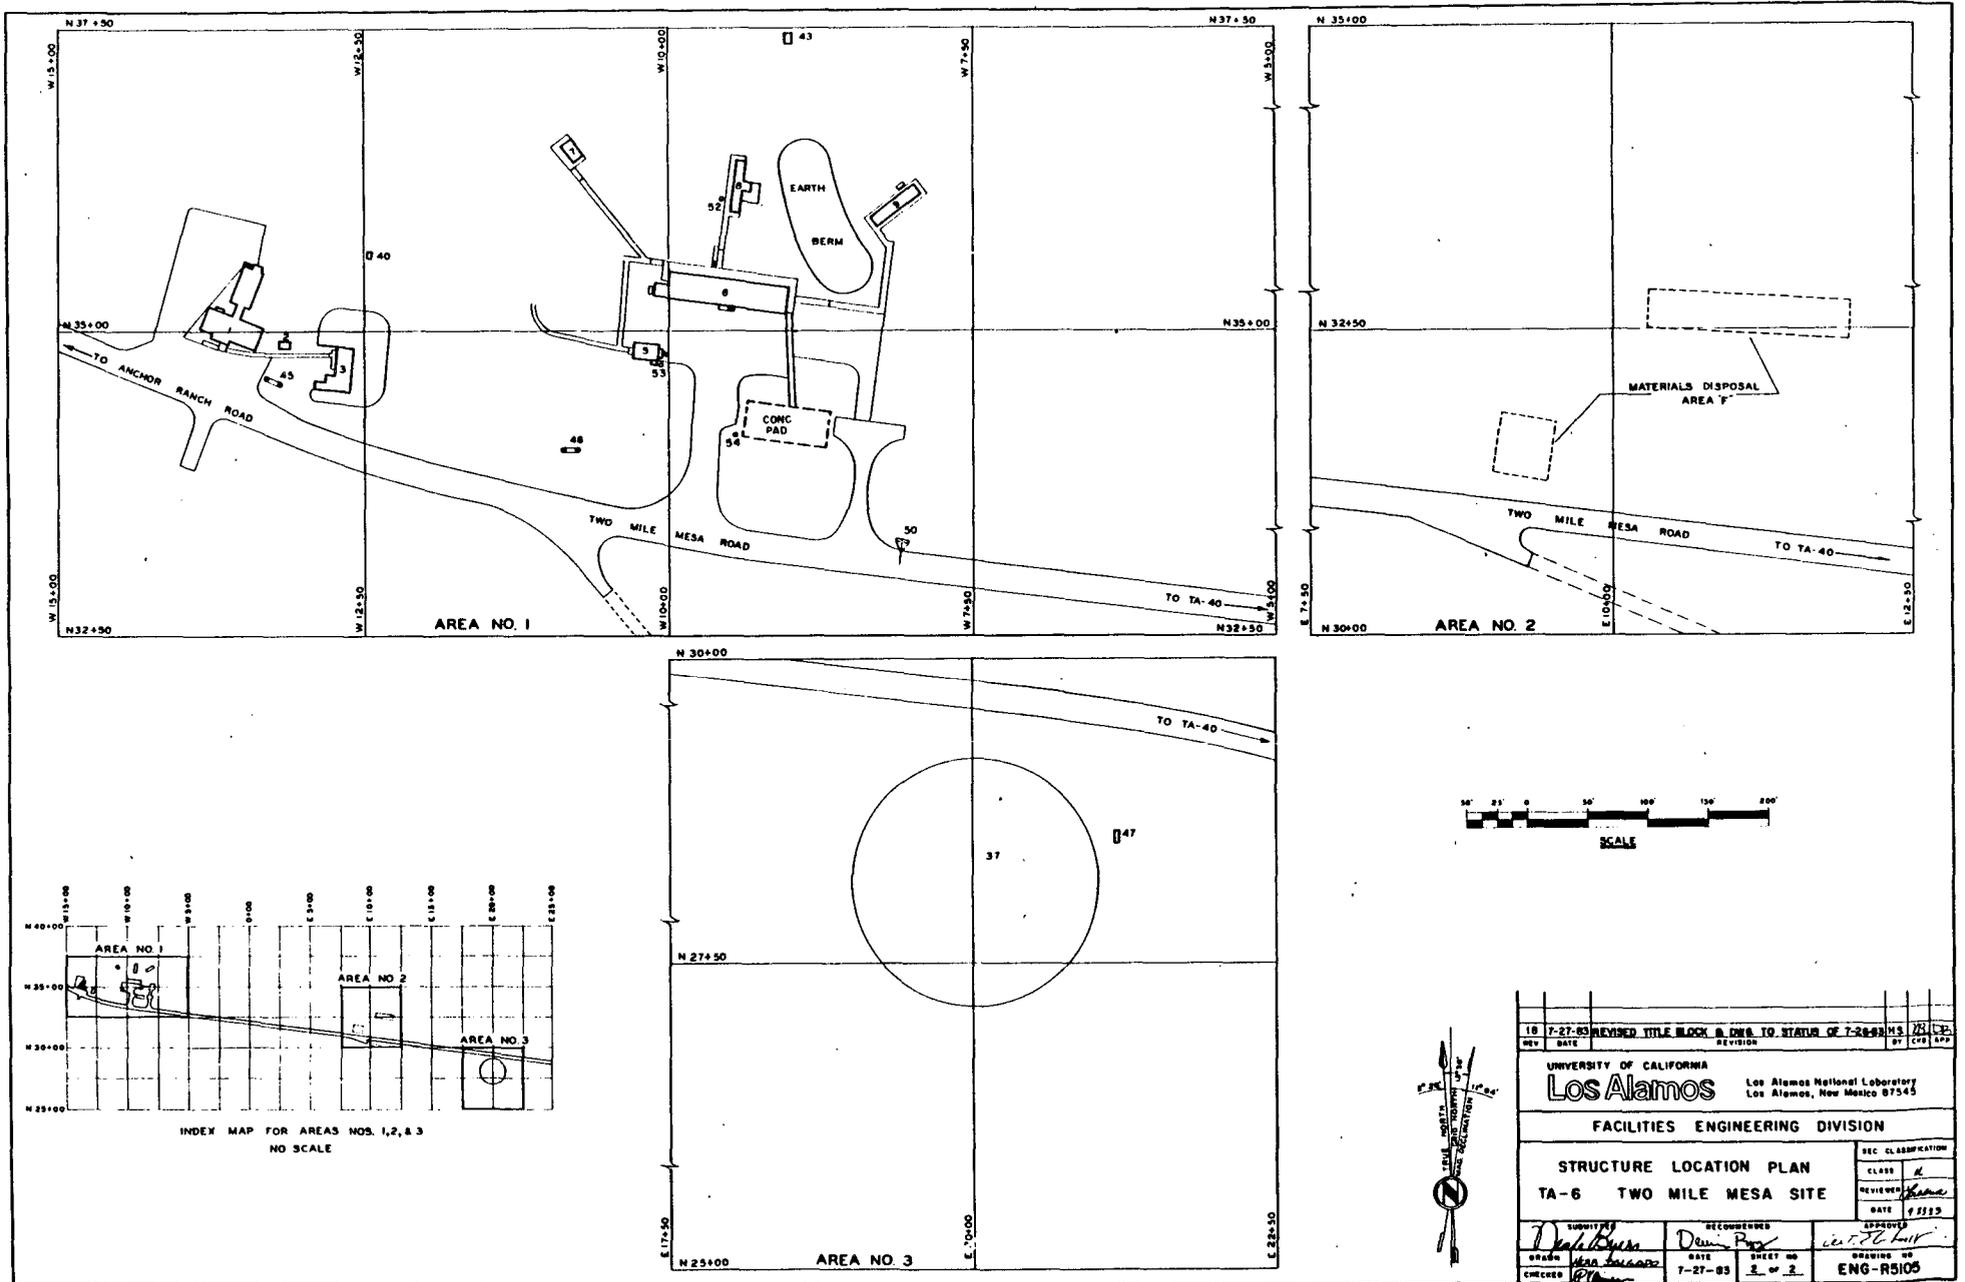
Structure Location Plan for TA-6 - Two-Mile Site (1983 Drawing from the LANL Technical Area Structure Location Plans)
